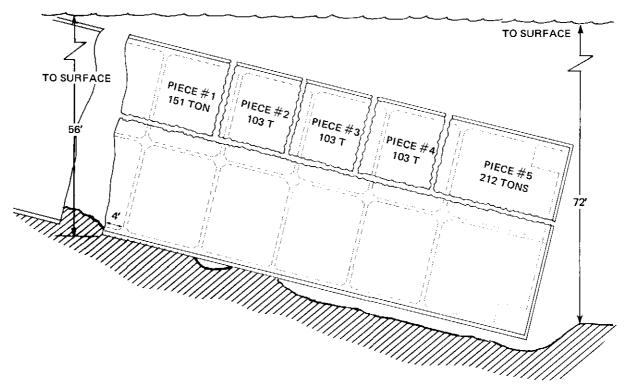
Caisson Bottom Section Showing Cuts
